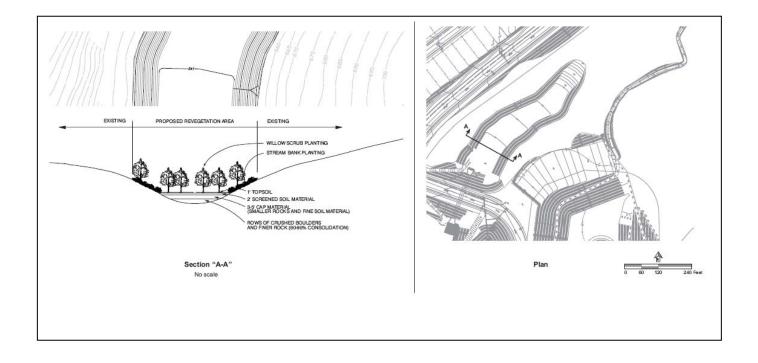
San Marcos Highlands. Proposed Profile Cross-Section and Plan View for Former Pond Site
